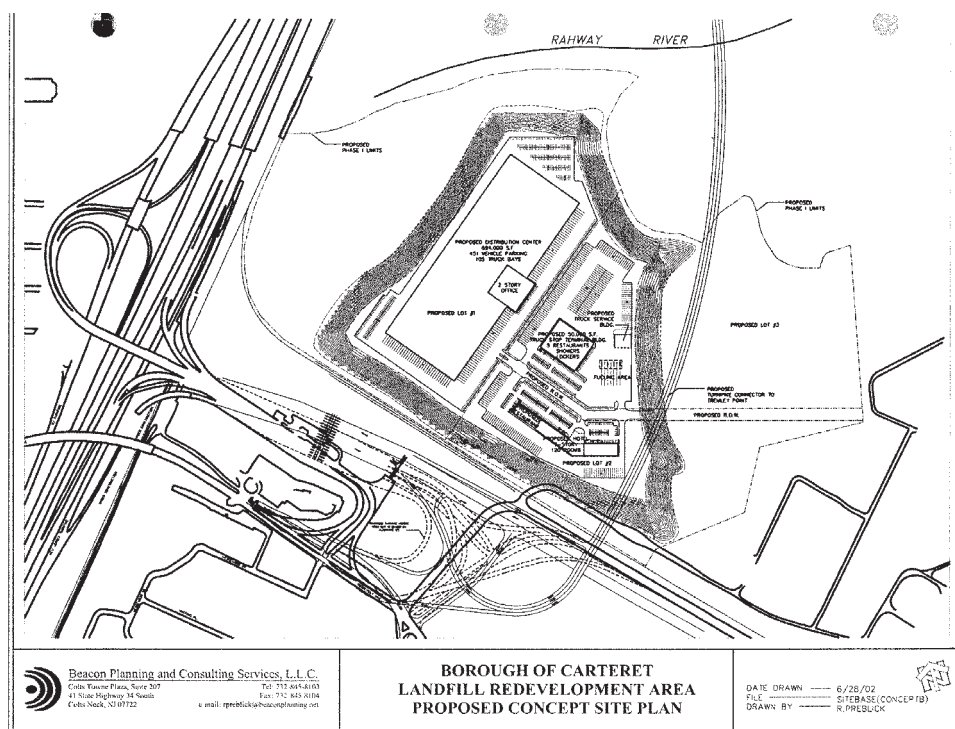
Proposed Concept Site Plan for Carteret Redevelopment Site
